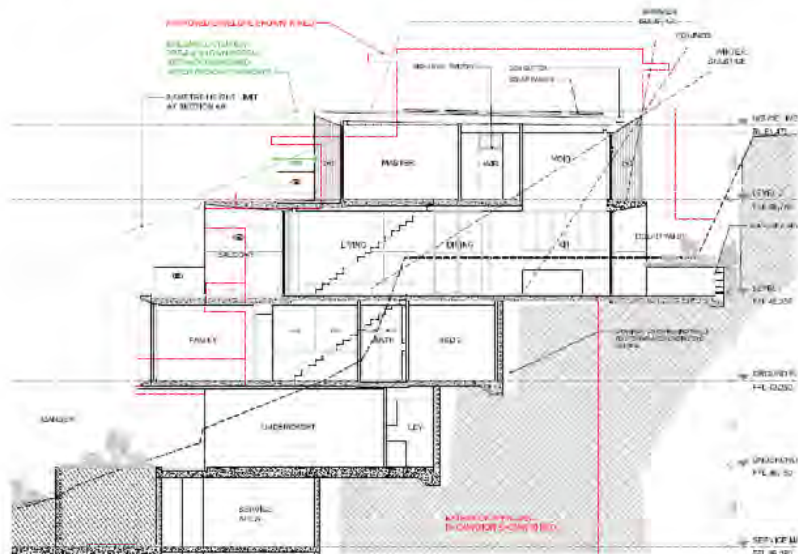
Plan extract Section AA showing minor 8.5m height breach
